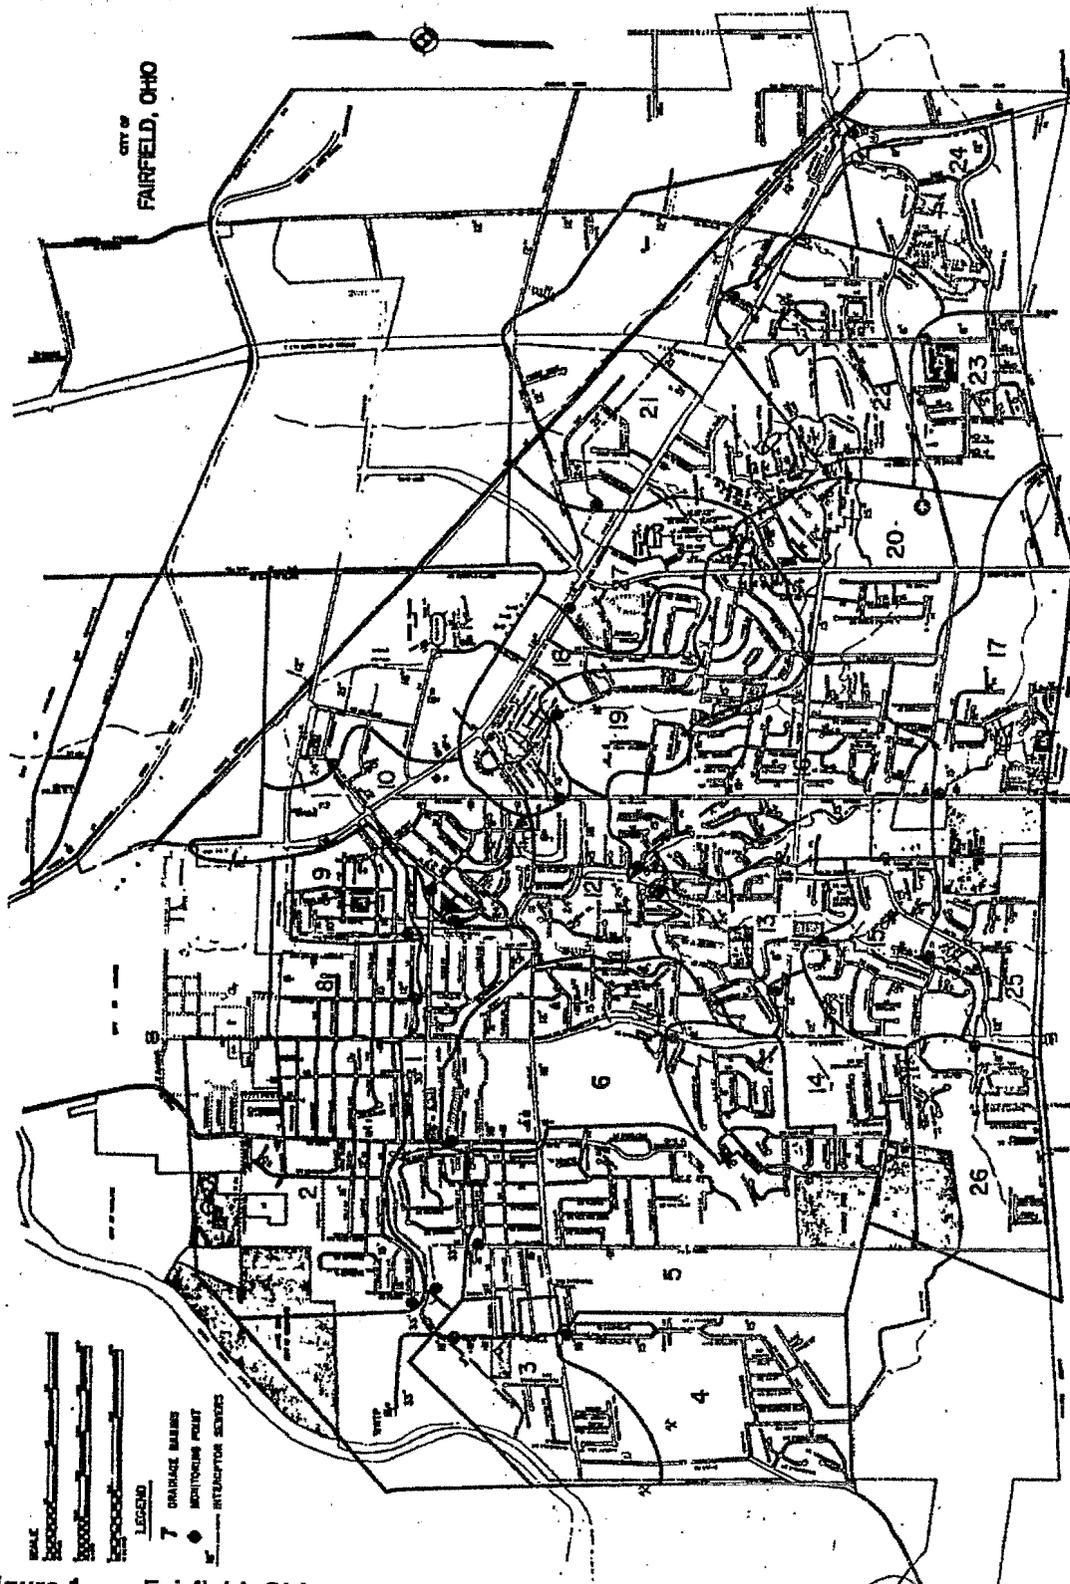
Fairfield, Ohio, wastewater collection system: existing interceptor sewers and drainage areas.
